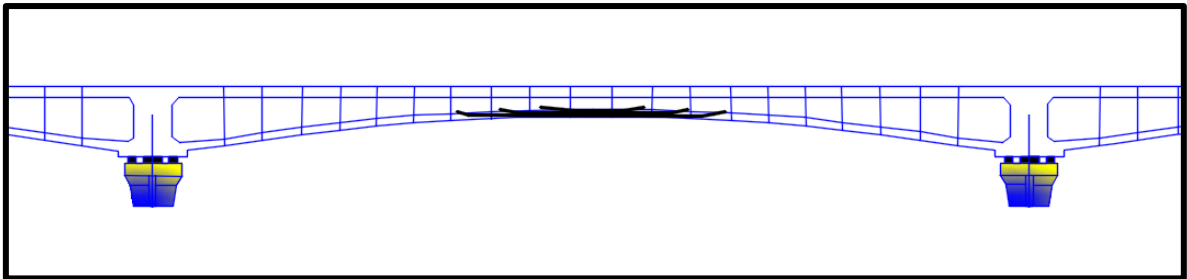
Design of Bottom Slab Continuity Tendons in Box-Girder Bridge
